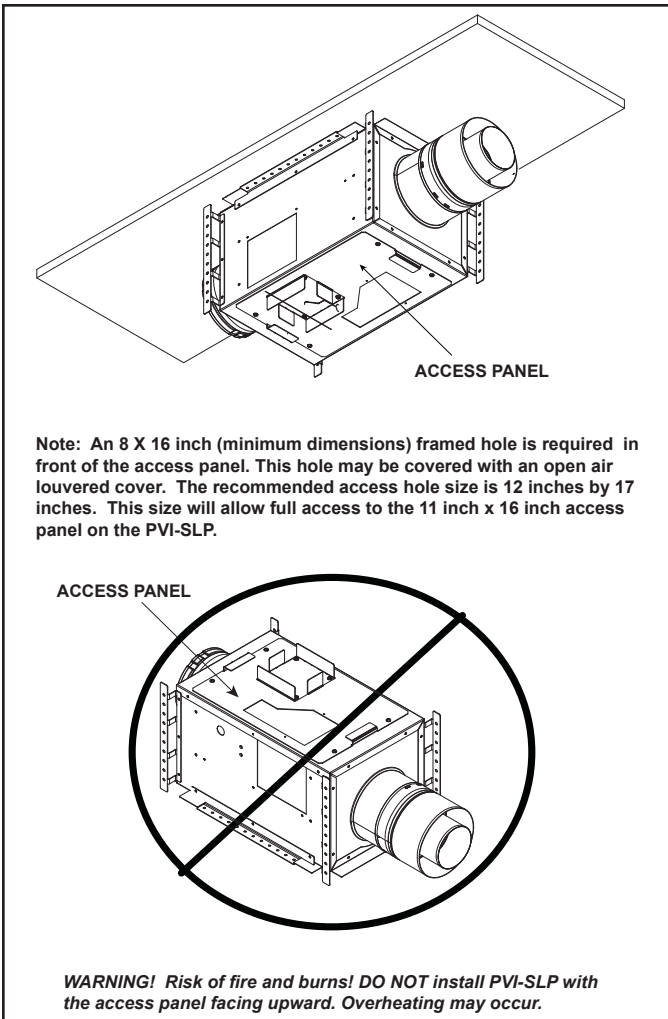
PVI-SLP Mounted to Horizontal Surface
